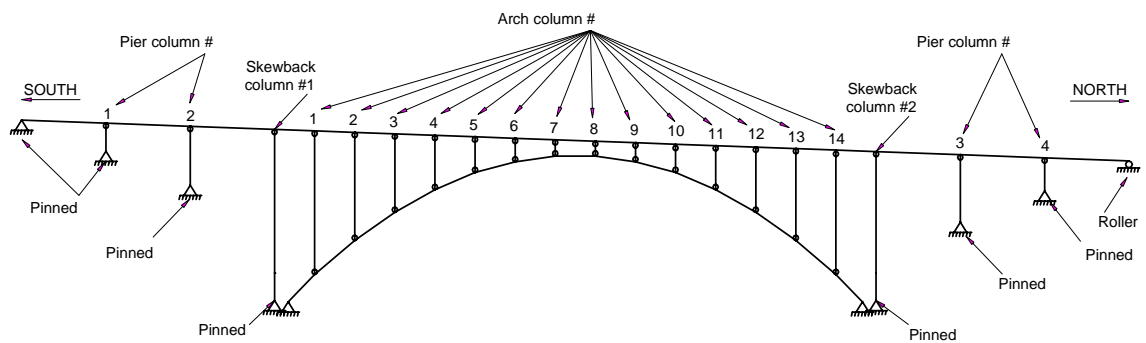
COLUMN rating model of pier, skewback, and arch columns.
